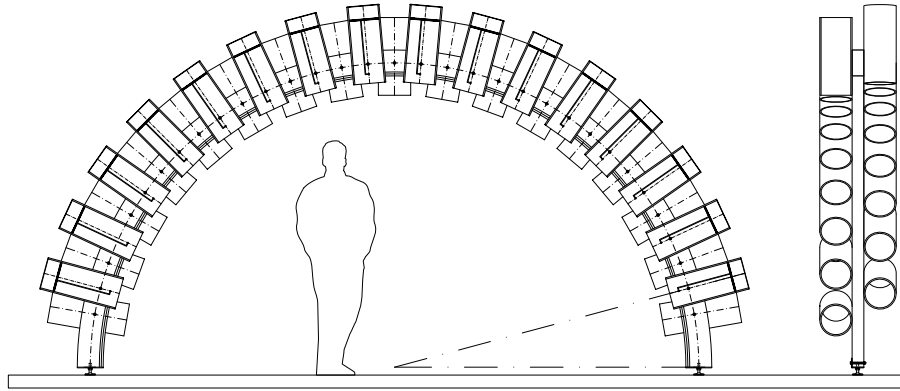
WUST Pavilion, version 3, detailed section, 2014
